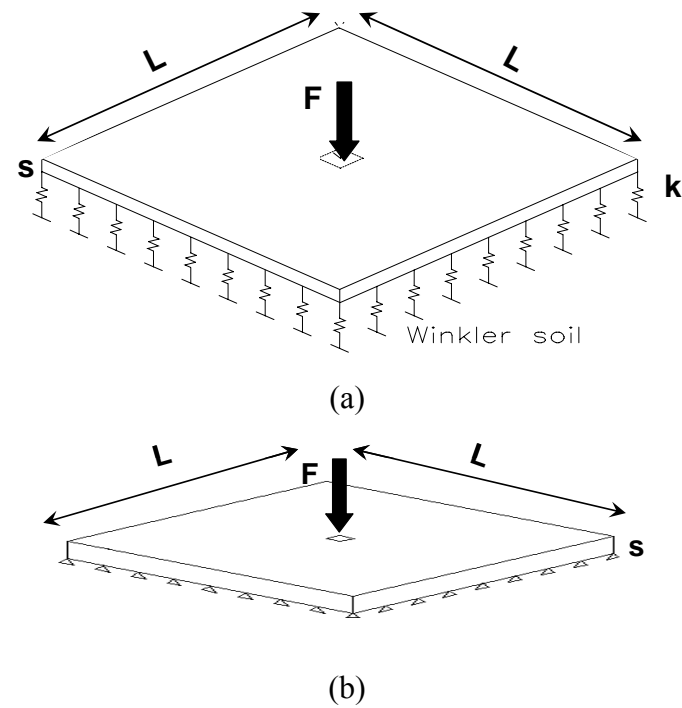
Slab on a Winkler soil (a) and supported on the edges (b).
